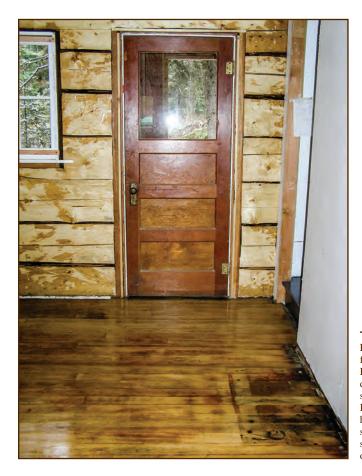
The refinished kitchen floor of the Adams Ranger's House shows evidence of past heat damage from a wood stove that someone didn't properly shield. Because it shows no evidence of heat damage, it's easy to tell that someone previously replaced a short floorboard where the stove once sat.
